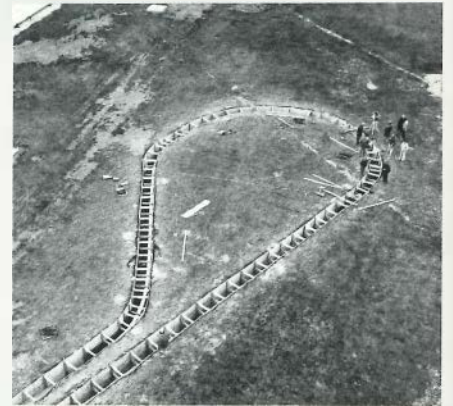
Obstructions, such as might be encountered in urban trenches, are represented in this test of the trench shoring in which the horizontal members (located 0.45 m [18 in] from the bottom of the trench) can be bypassed without difficulty.
